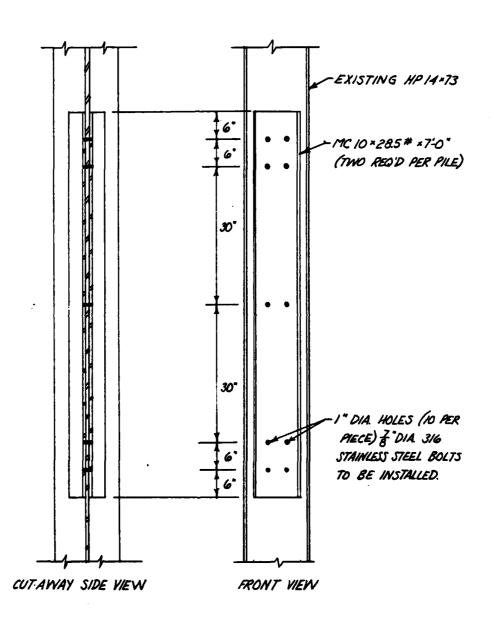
ALTERNATE PILE REPAIR RY INISWELLING
